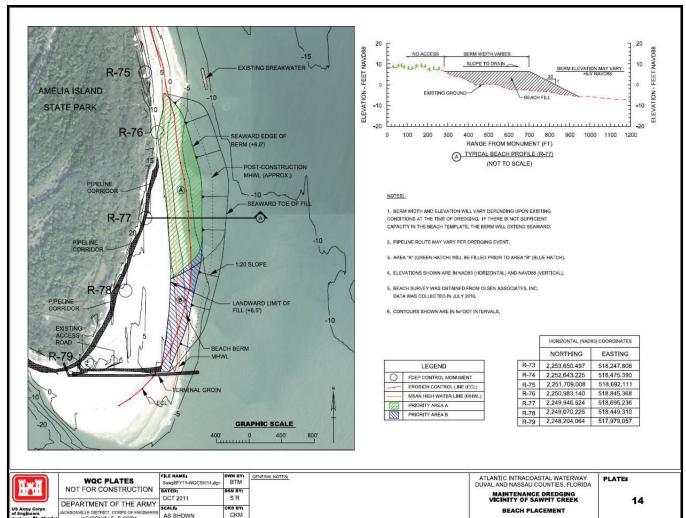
AIWW Sawpit dredging beach placement plan, 2011 permit.
